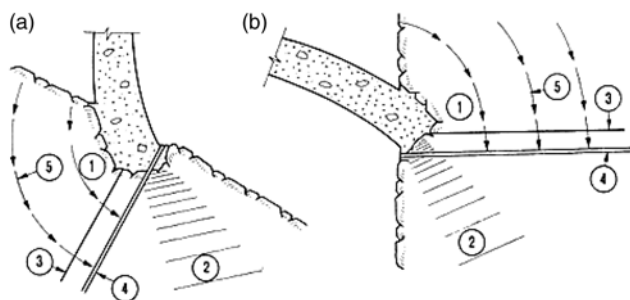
Vertical (a) and horizontal (b) cross-sections of arch dam rock foundation showing: 1 & 5, flow lines; 2, compressed zone; 3, grout curtain; 4, drainage curtain (after Londe & Sabarly 1966).
